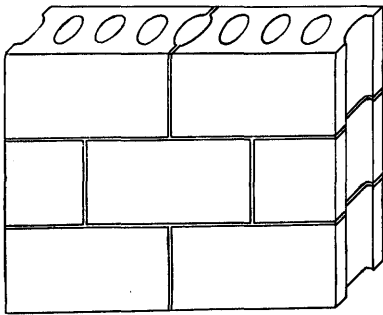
8-INCH HAYDITE BLOCK WALL
